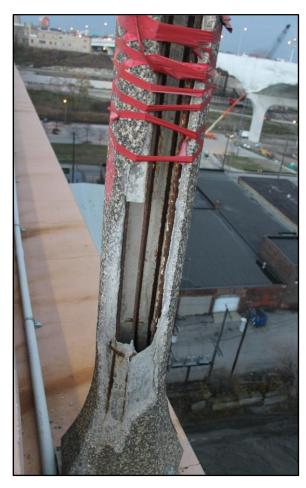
Critical Deterioration of Light Pole, Span 5, South Fascia (Light Standard No. 11S).
